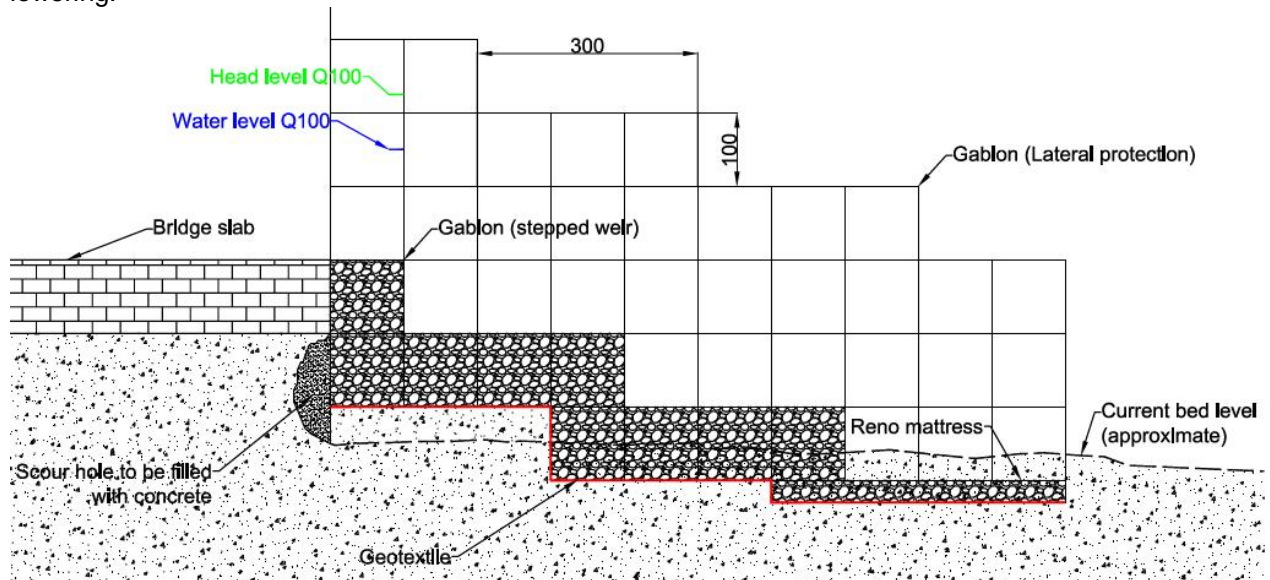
Stepped weir downstream of Rwebeya road NR2 Bridge - Longitudinal profile
